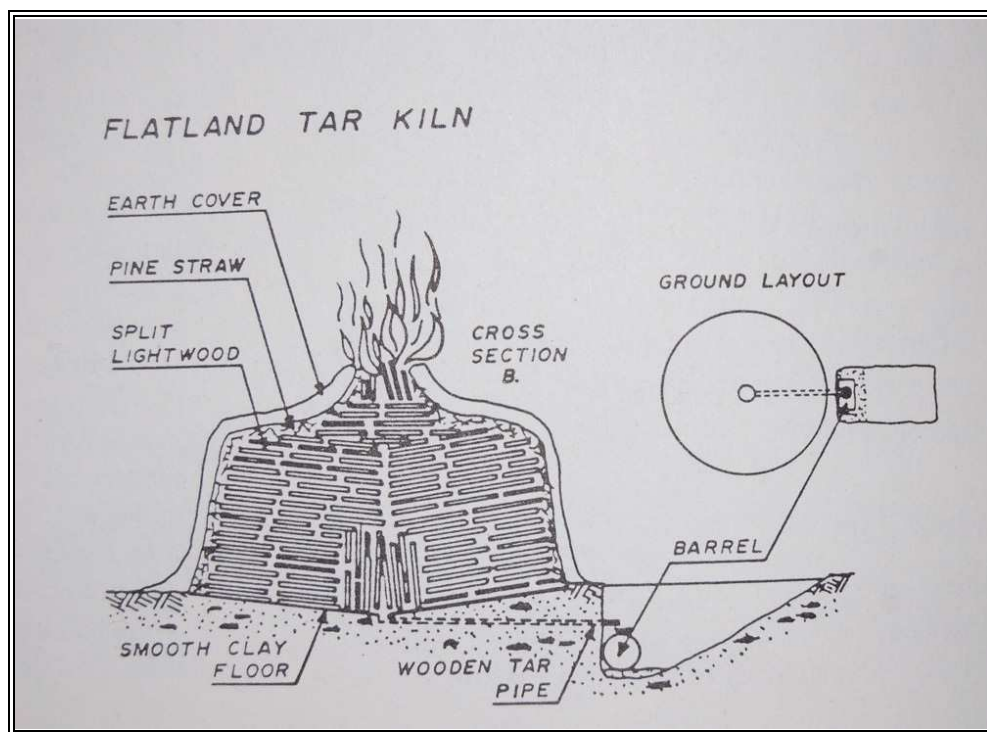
Sketch of tar kiln cross-section and plan view (Combes 1974:10).
